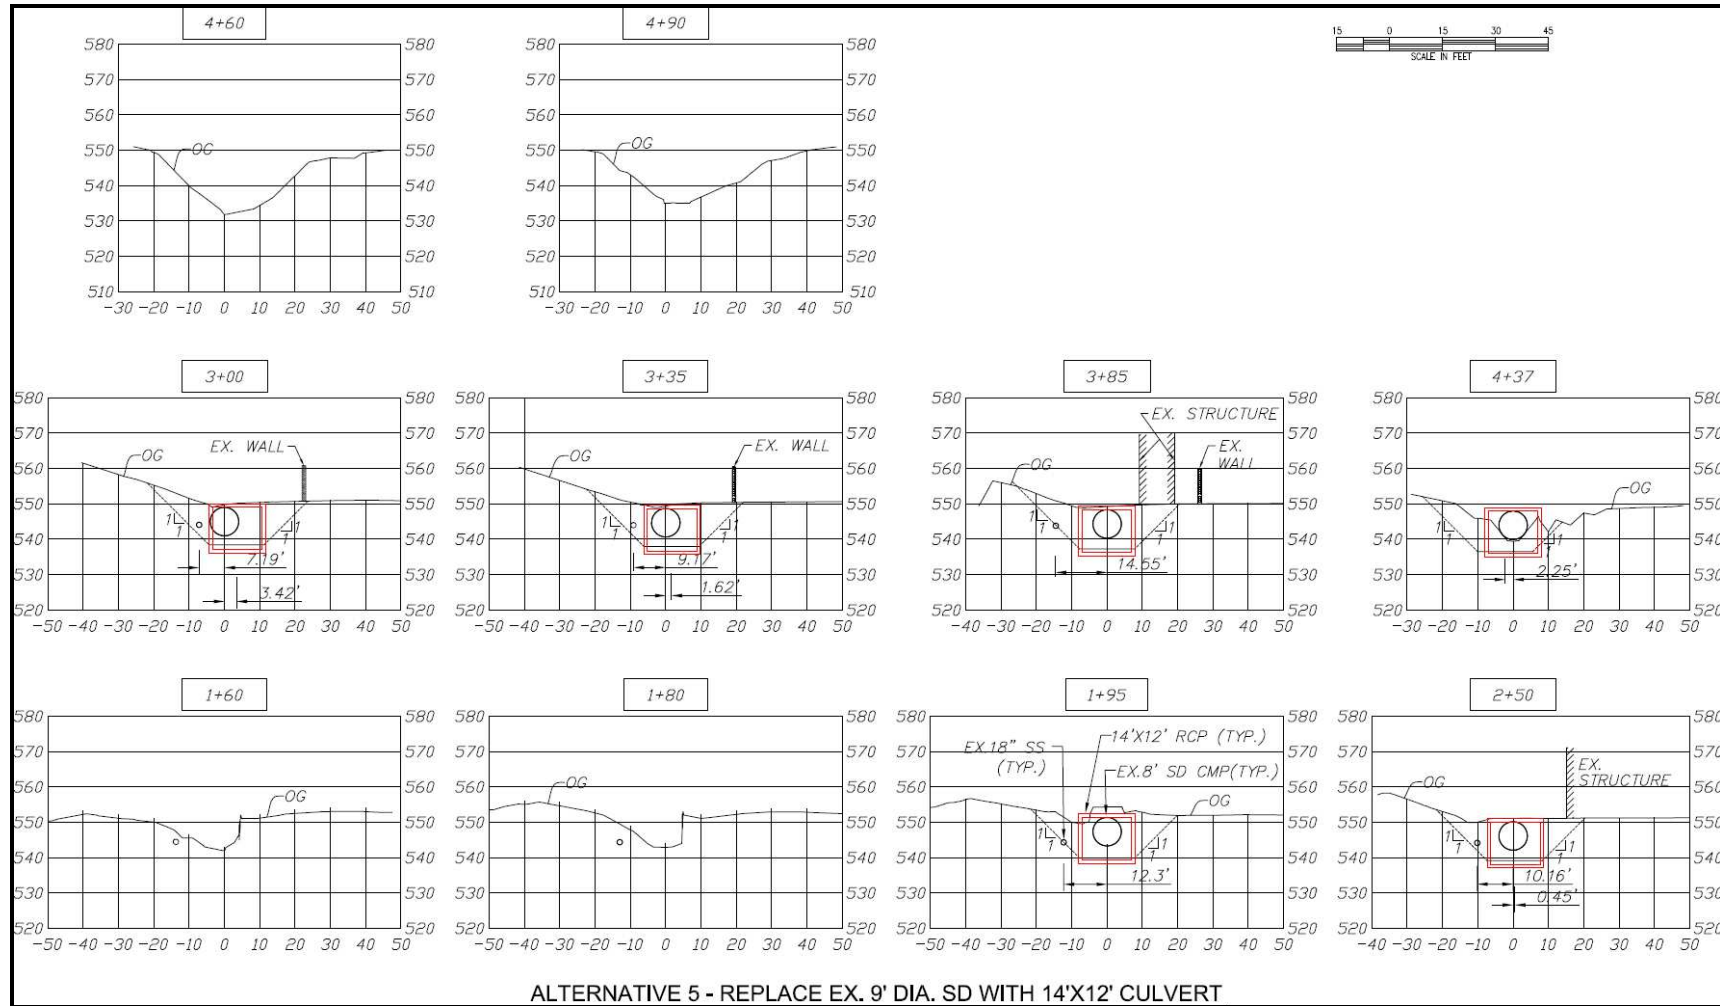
Cross Sections for Alternative 5 – Replace Existing Culvert with 14-ft by 12-ft Box Culvert
